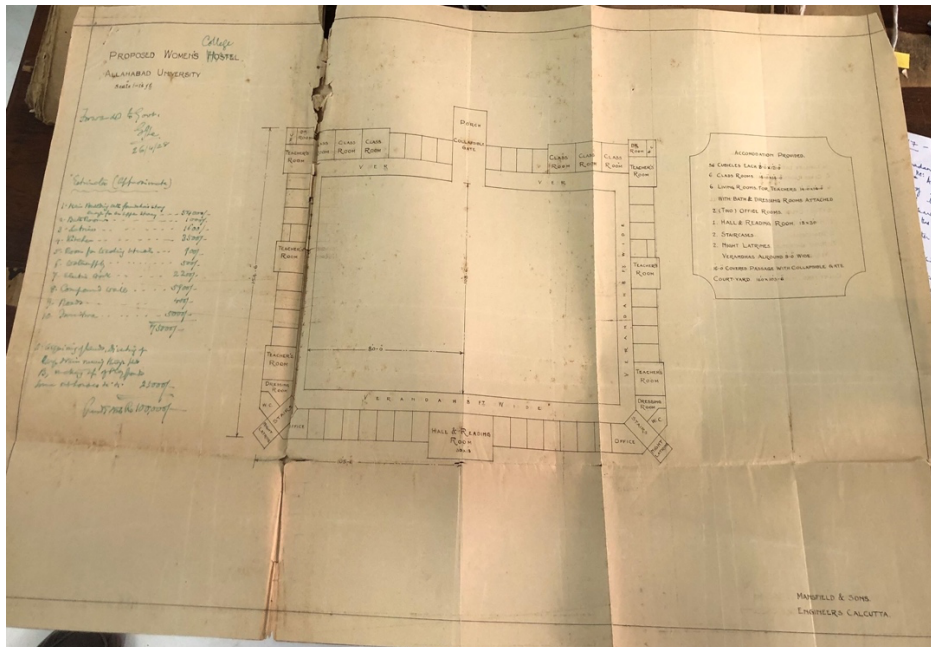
Building Plan for the Women’s Hostel/College, Allahabad.
